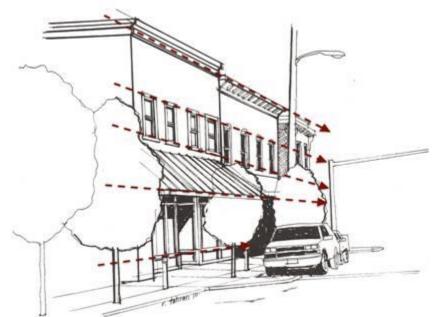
Articulation of Horizontal Lines, Ground Floor and Upper Floor Division
